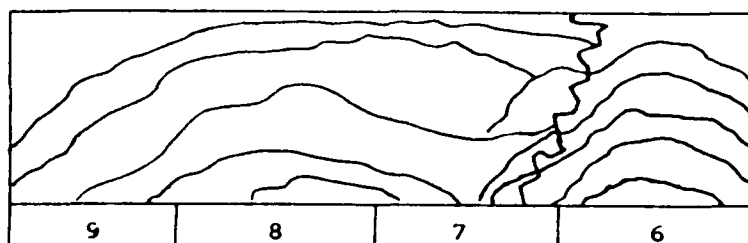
Cracks in concrete floor in front of the storage rooms
